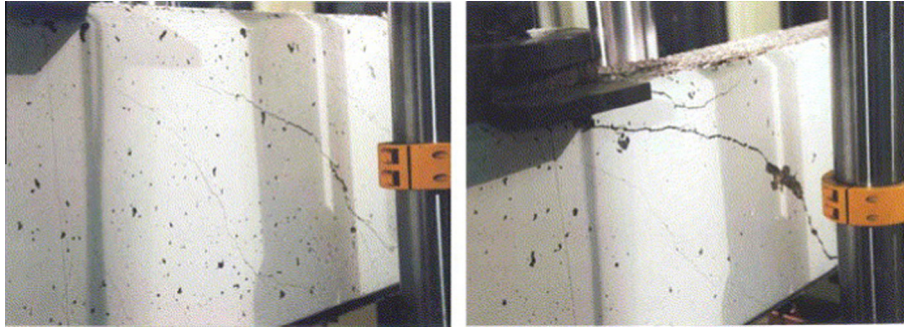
Cracking prior to failure and at failure in a rectangular beam with web reinforcement (photographs from the authors) [3].
